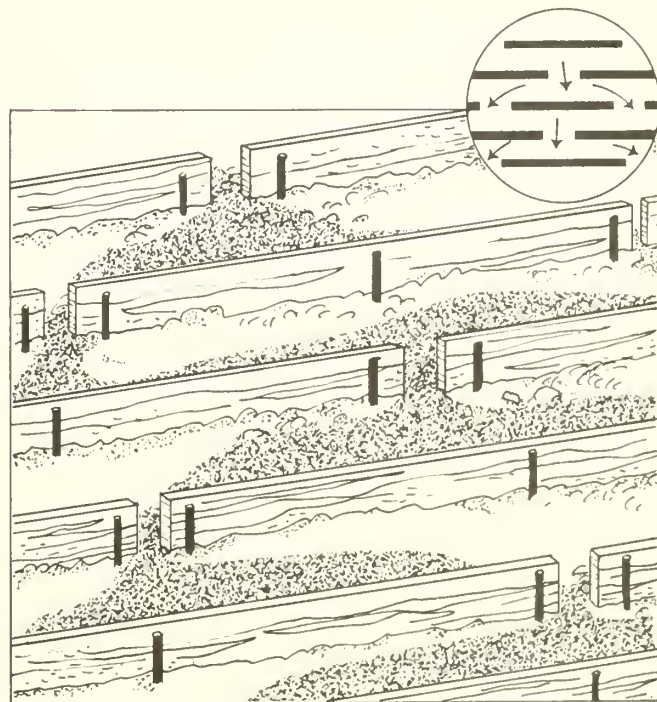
Pretreated or redwood boards help stabilize the face of soil slips.
